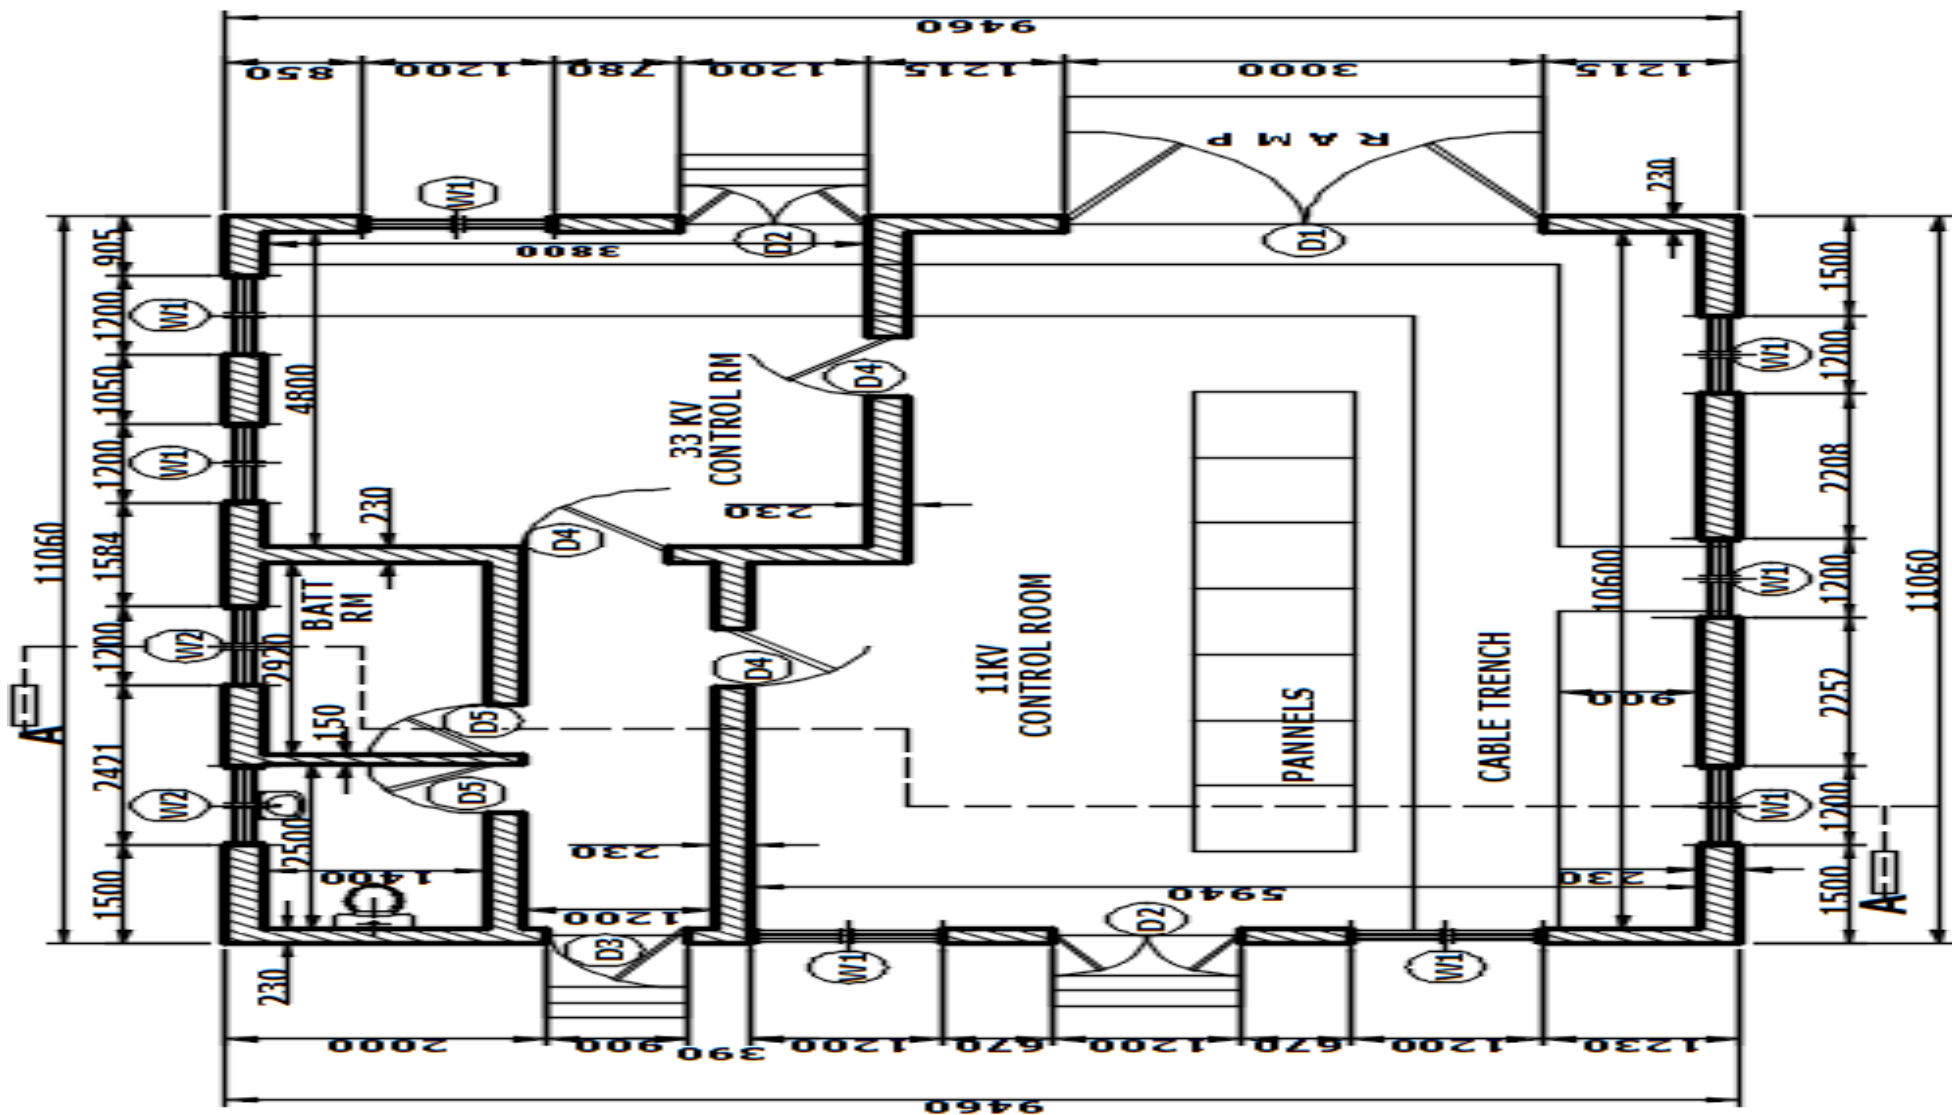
Detailed control room floor plan (all dimensions are in mm)
